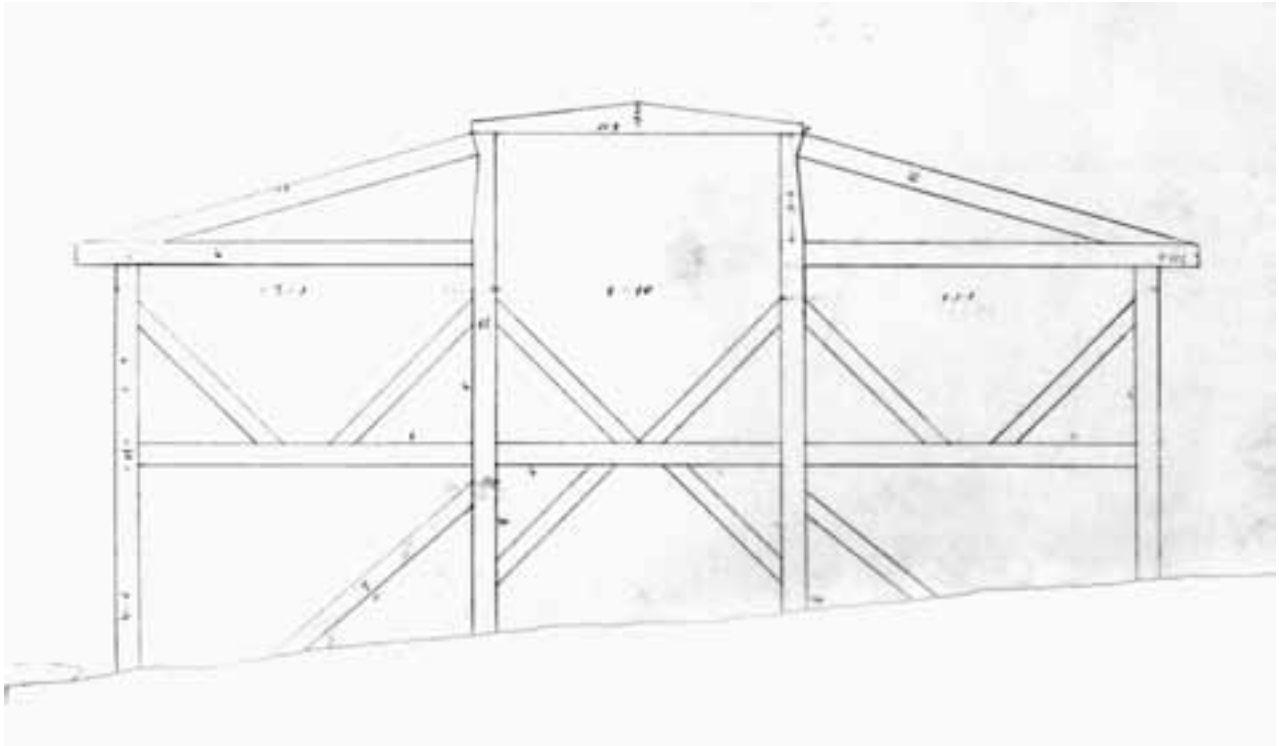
(Top) End Framing for West Front Attic, drawing, 1840s, William Weeks, LDS Church Archives. This drawing shows a detail of the framing and roof line of the west front attic section.
